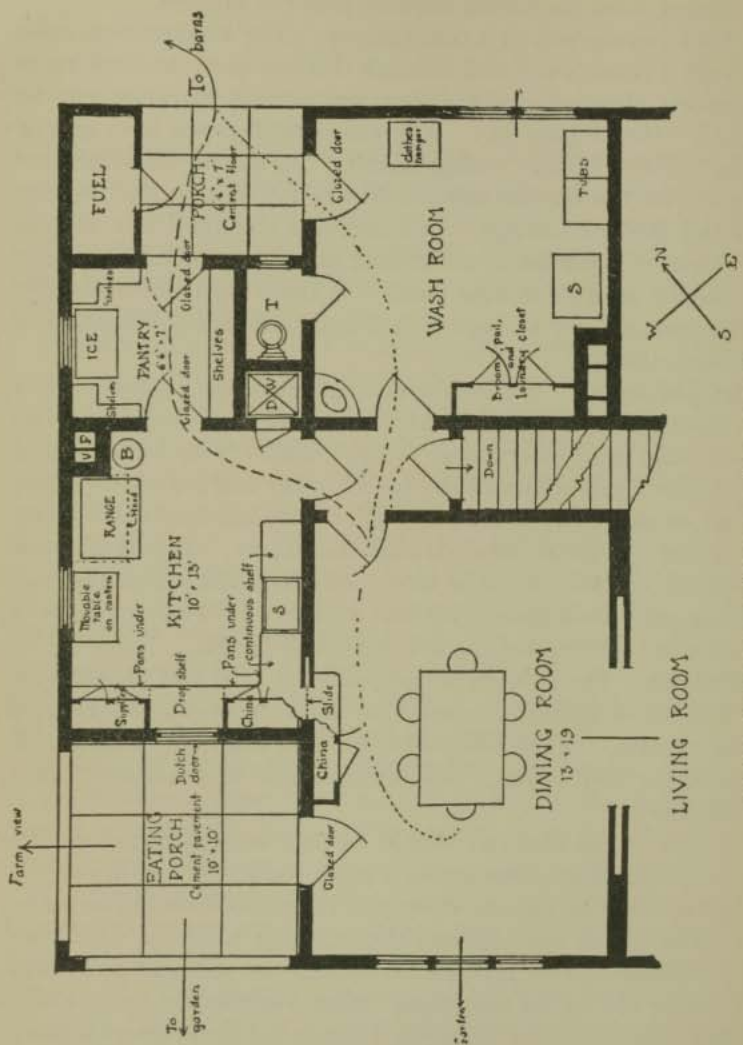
PLAN OF THE WORKING AREA OF A FARMHOUSE
